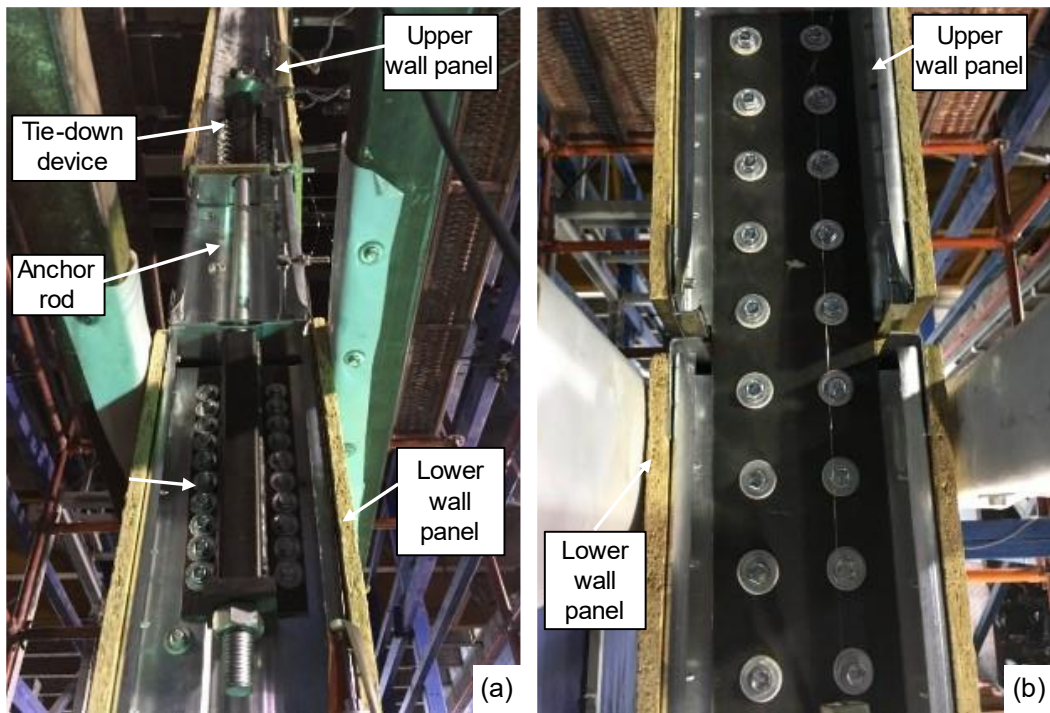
Connections between first and second floor shear walls: (a) tie-down connection for platform framing; (b) steel strap tie connection for ledger framing
